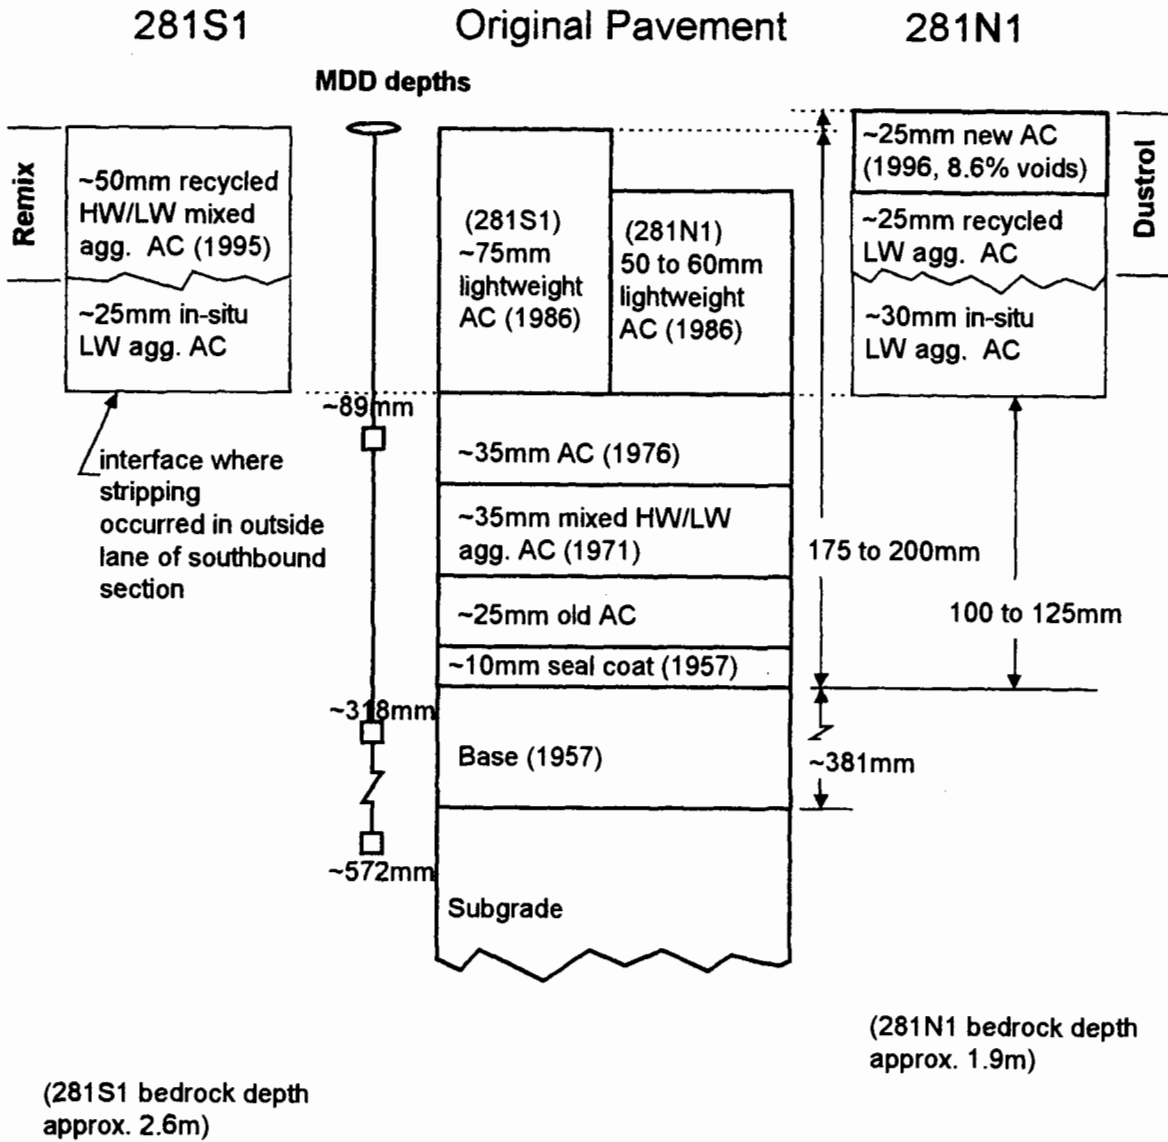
Pavement Sections for Pads 281S1 and 281N1
